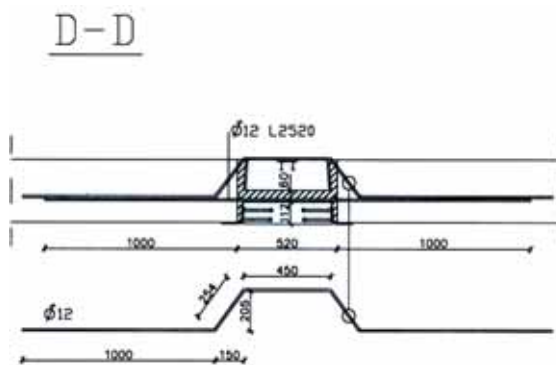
Section along joint between adjacent slab units, see Fig. 2. The rebars are made of A500 HW.
